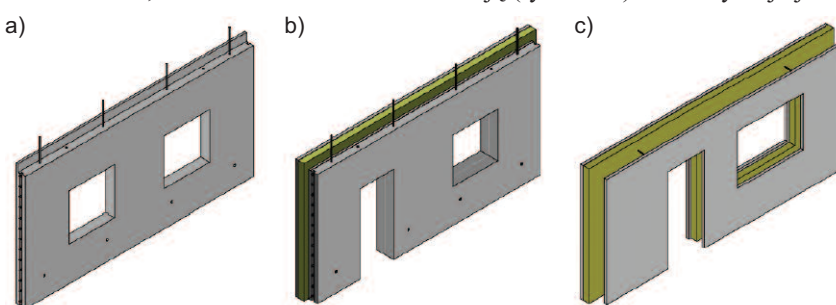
Types of prefabricated concrete or reinforced concrete walls [4]: a) solid wall; b) sandwich wall; c) wall combined with insulation
